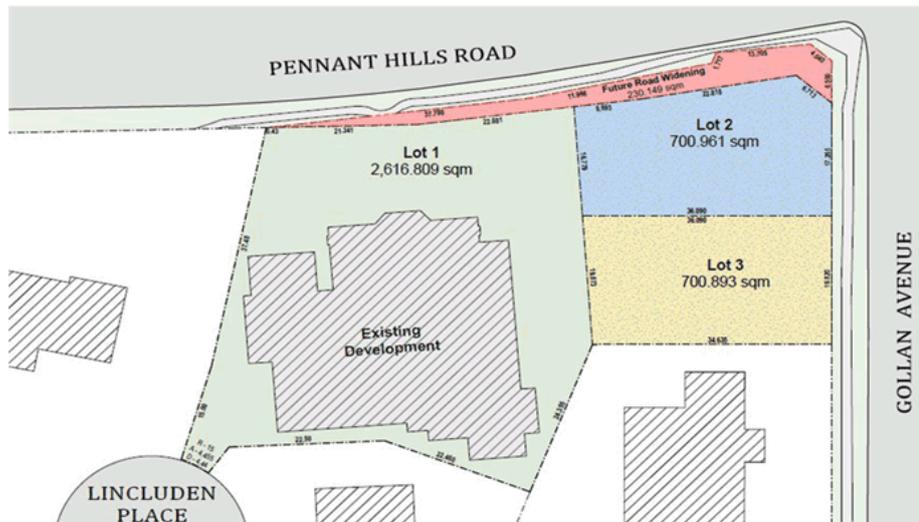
Indicative subdivision plan for the site at 8 Lincluden Place, Oatlands
